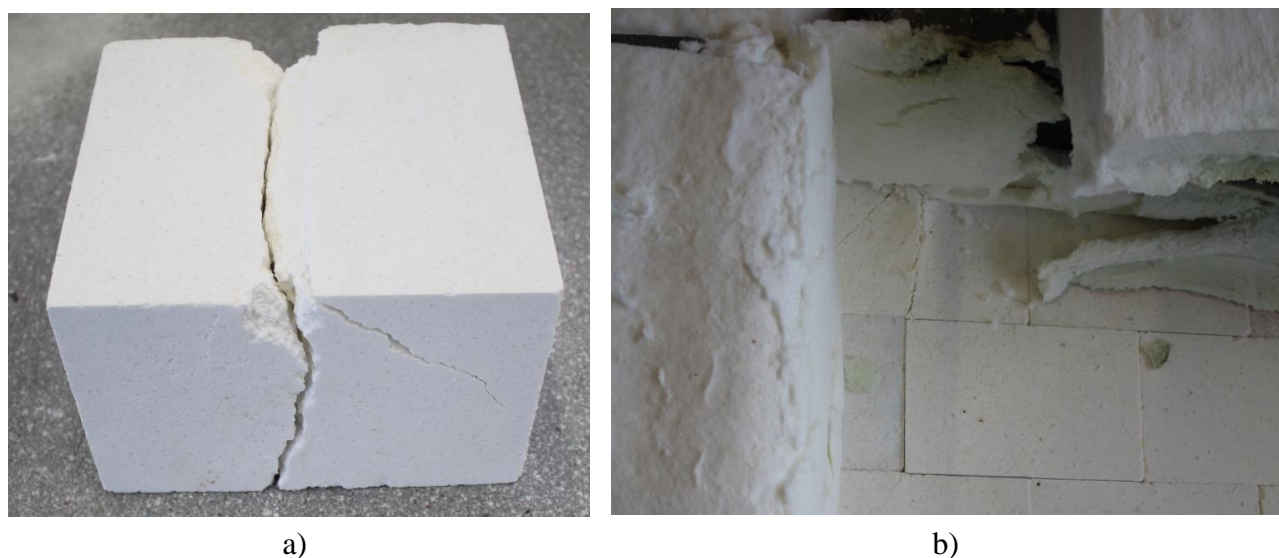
Test series S09.HT.CBJ – Creep failure at the brick adjacent to the plunger chamfers: a) details of the failure; b) Location of the brick
